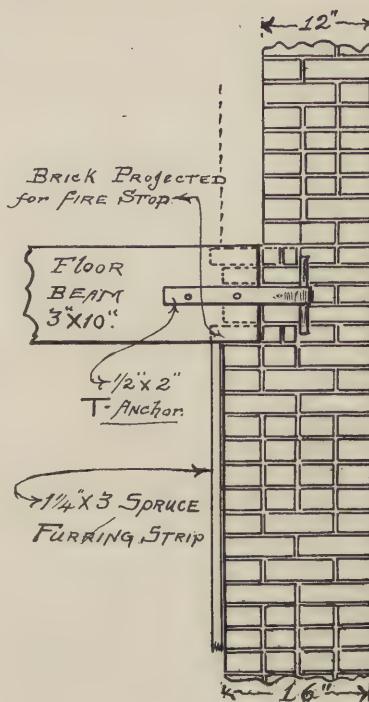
SECTION OF WALL AND ANCHORED BEAMS.
